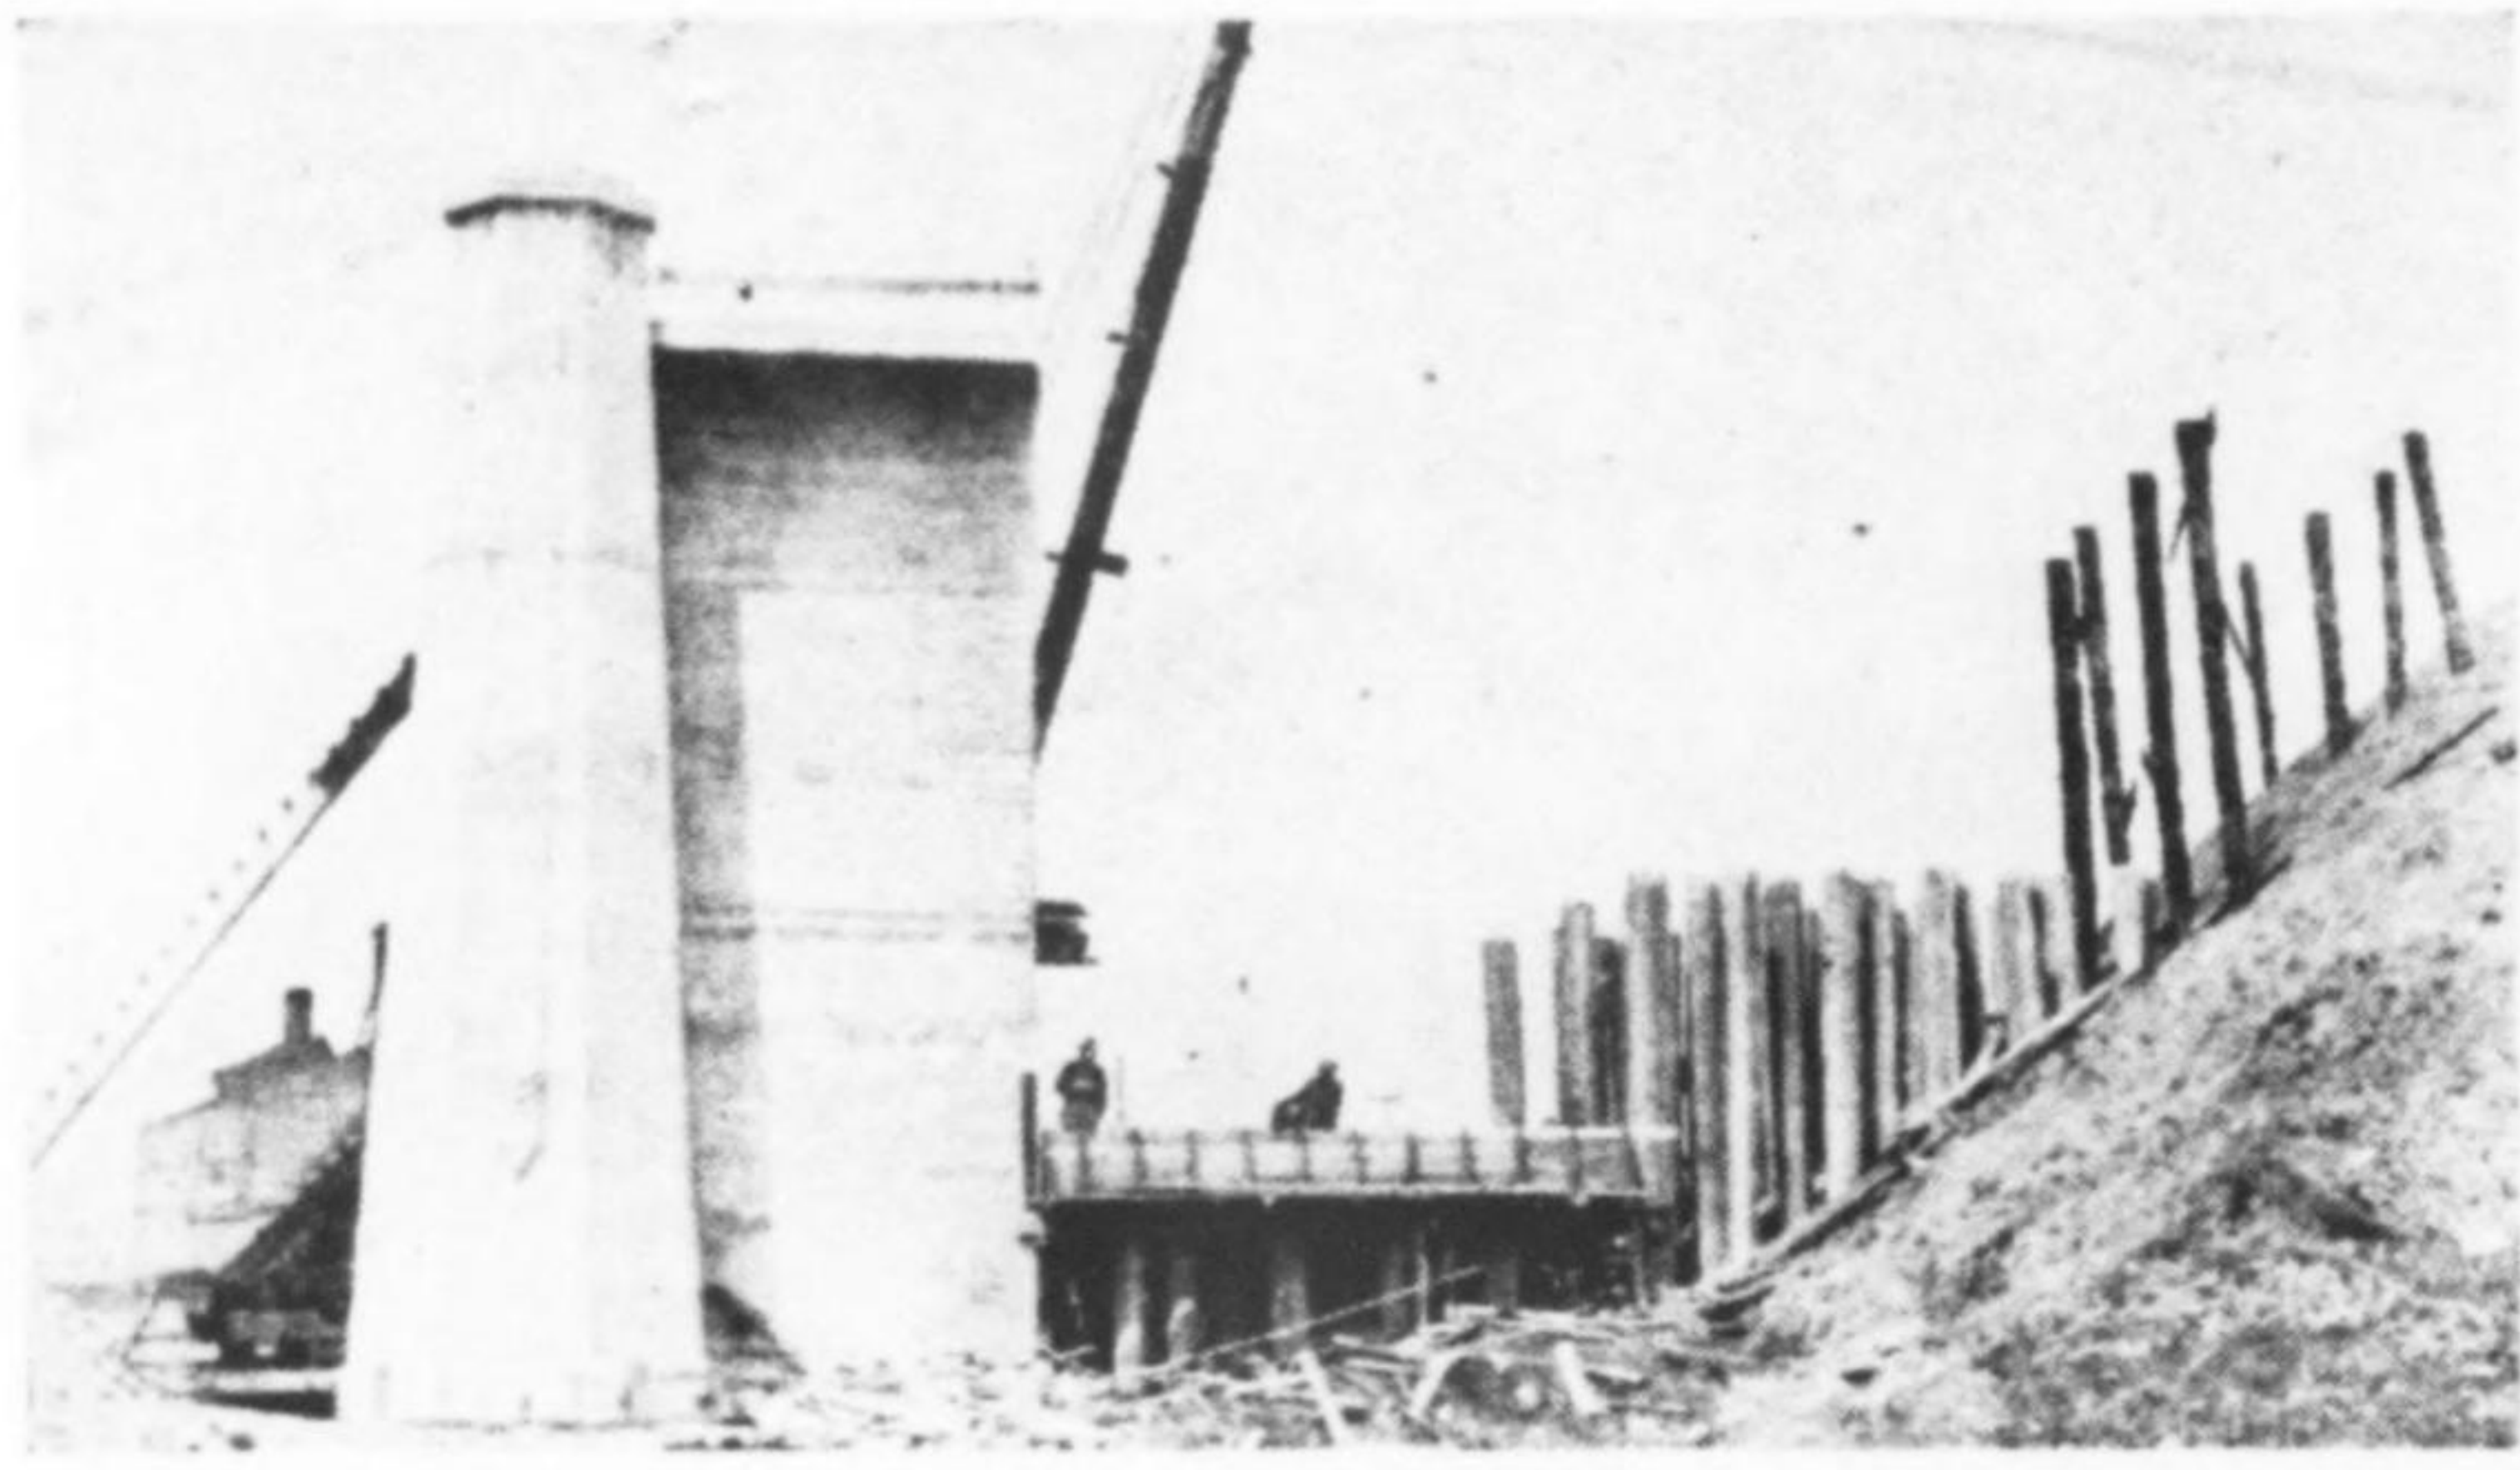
EAST PIER, WITH CONCRETE PILES TO CARRY APPROACH
